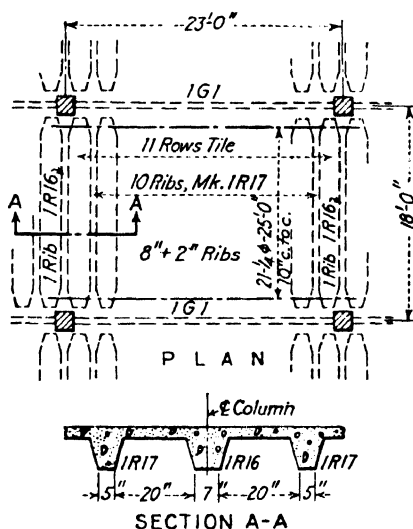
Method of detailing ribbed floors with concrete girders.
